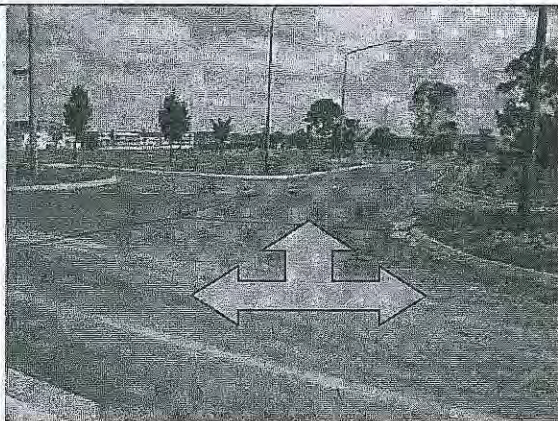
The Valley Avenue and Warwick Street Intersection. An arrow indicates Warwick Street Area.
